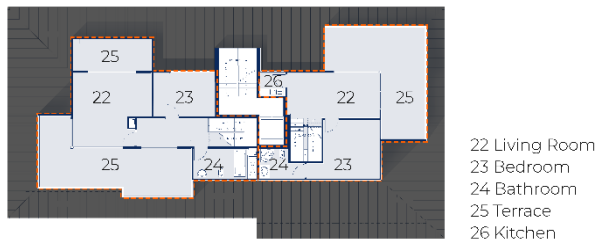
Nursel Kaymakçı Apartment Roof Floor Plan.
